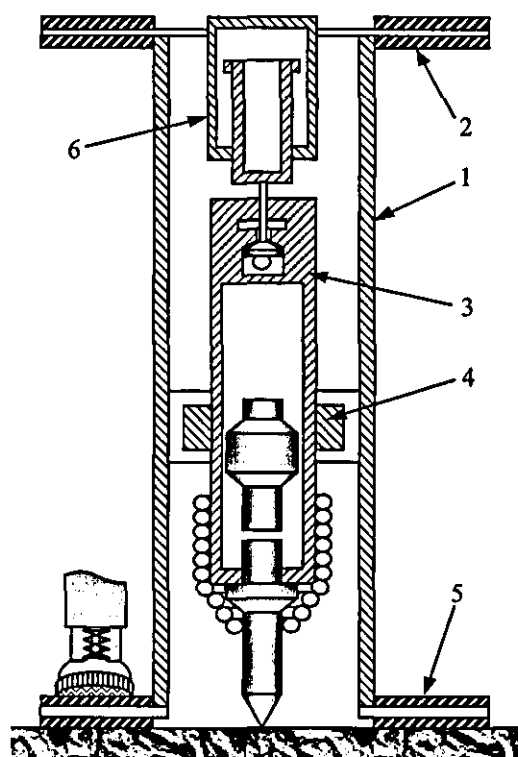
Schematic cross-sectional view of pneumatic hammer
